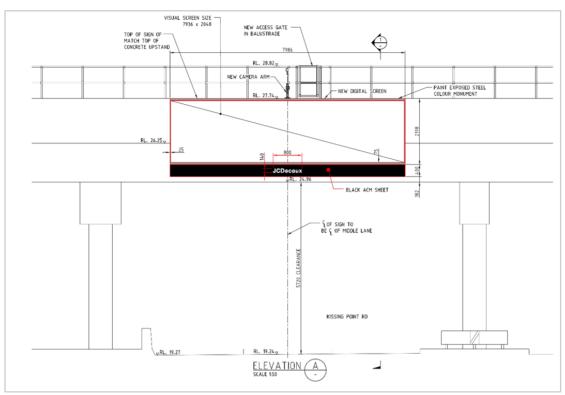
Northwest elevation of proposed sign (Source: JCDecaux)
